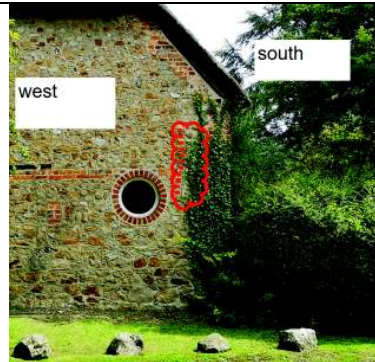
signs of thermal cracking on new hard clunch building near by the church
